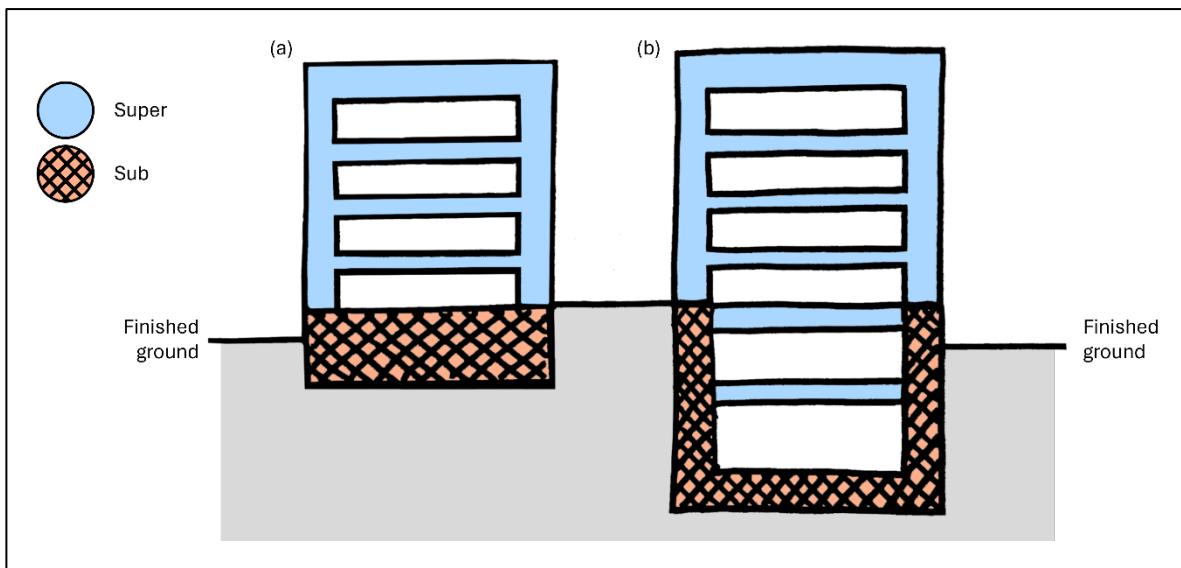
Delineation between sub- and super-structures for a building (a) without and (b) with basement. Note that the level of finished ground corresponds to the lowest level of ground around the building. Adapted from (ICMS 2021)
